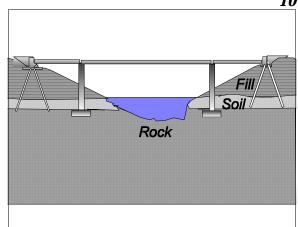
Three -span bridge with piers founded on bedrock and located in the approach embankments and abutments located on point-bearing piles.
